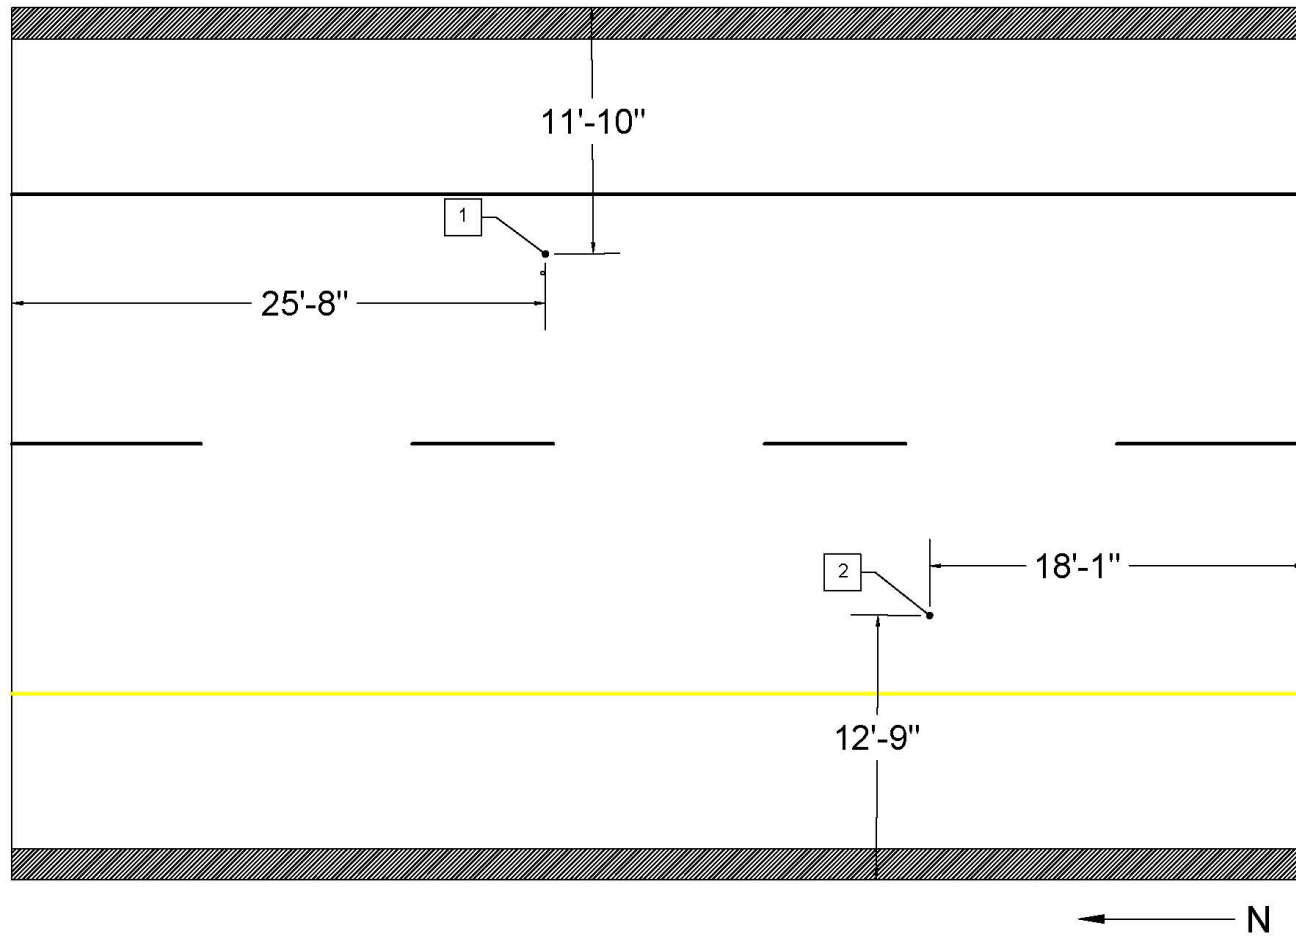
Sampling locations for concrete collected for cylindrical and beam specimens for Upper Ridge Road SB deck.
